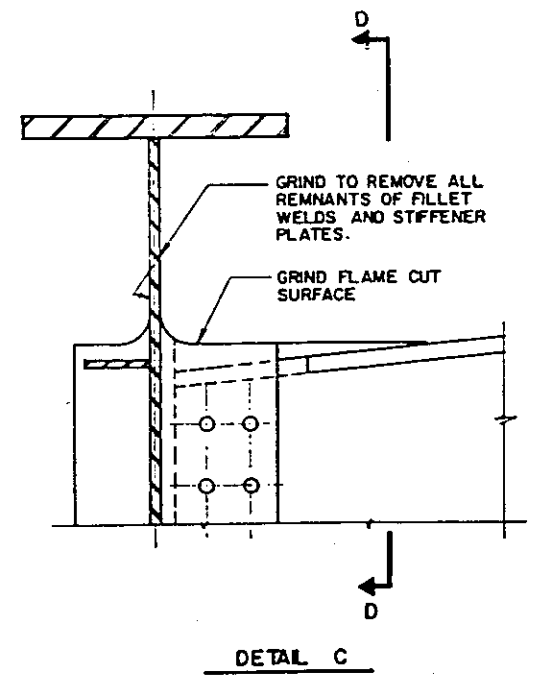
DETAILS FOR REPAIR OF GIRDER WEB CRACKING AT FIRST INTERIOR FLOOR BEAM - TO-GIRDER CONNECTION
